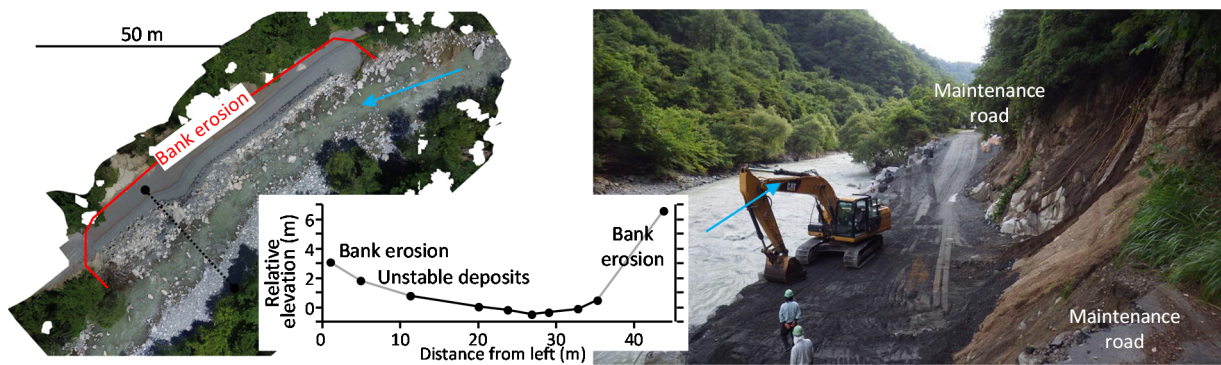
Plan view, cross-section, and close-up view of the road failure (bank erosion) 200m downstream from SBT outlet.
